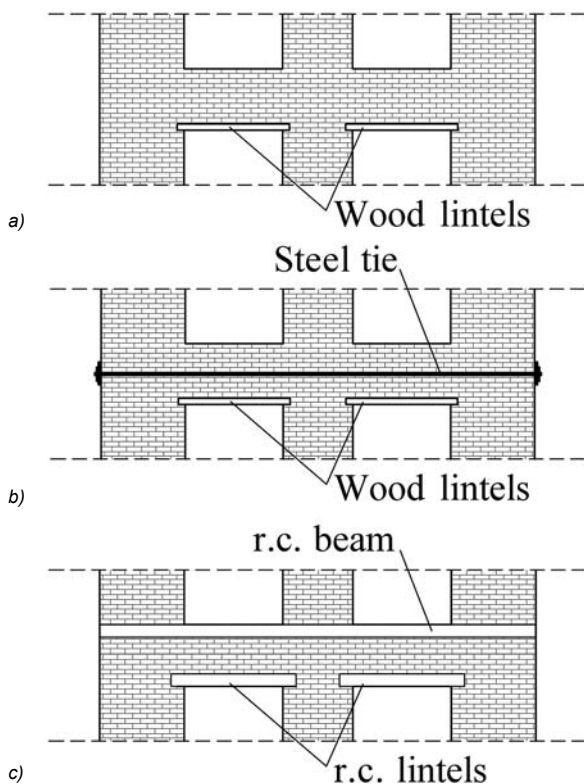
Spandrel beams classes: a) weak spandrel, b) spandrel with single tie, c) spandrel with double traction-resistant element
